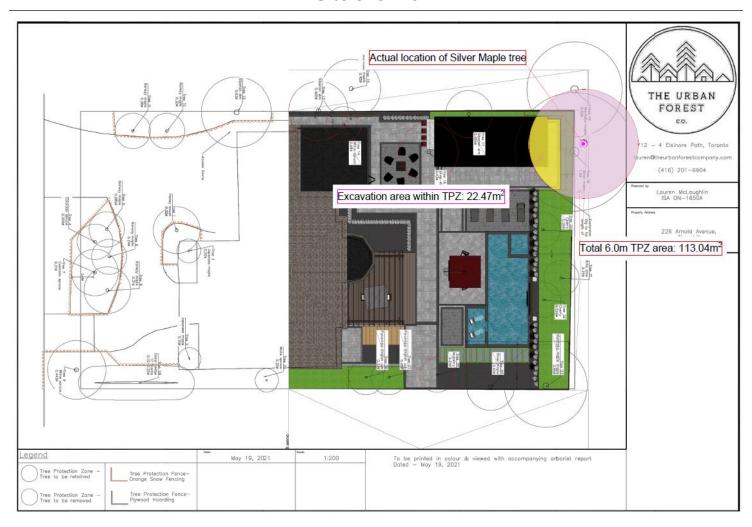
Cropped Site Plan of 226 Arnold Avenue showing proposed building footprint. Approximate area of excavation within TPZ of the Silver Maple is indicated. 22.47m² equals 19.87% of the TPZ. Closest excavation distance of 2.1m from tree threatens structural instability
